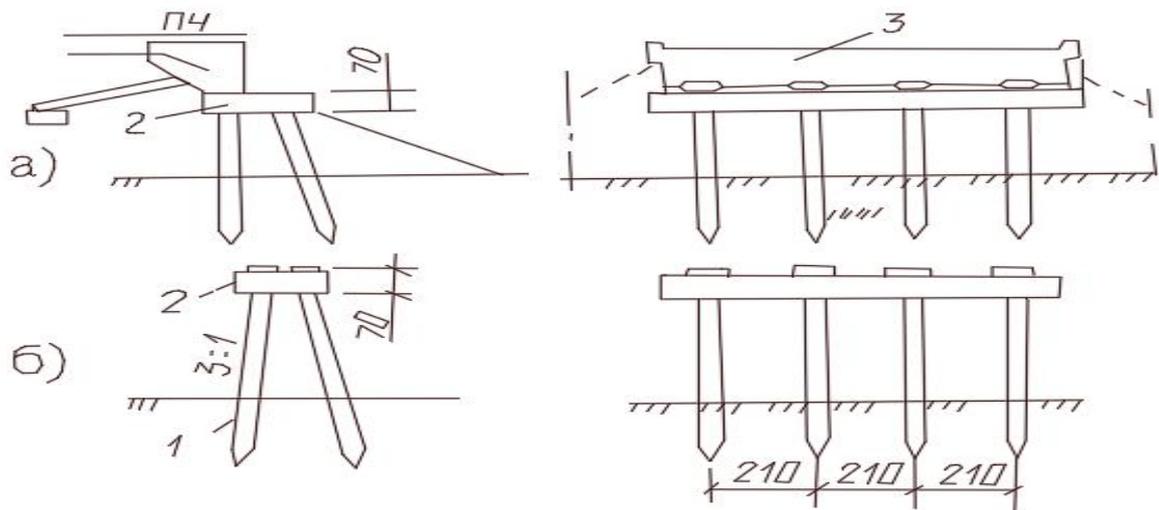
Pile supports: a - the bridge of the road bridge;
